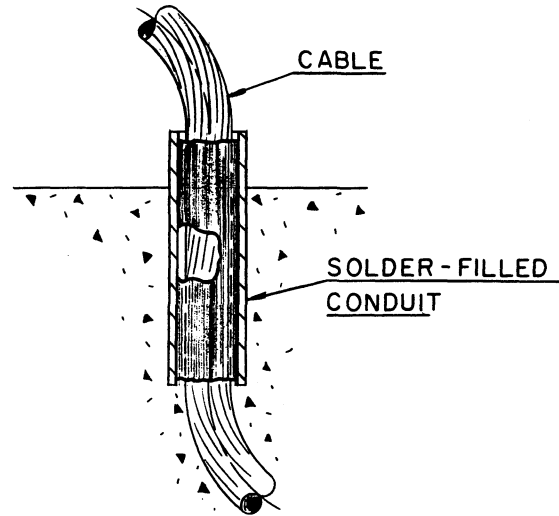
Details of air seals at joints in the foundation structure of the HFBR building.
